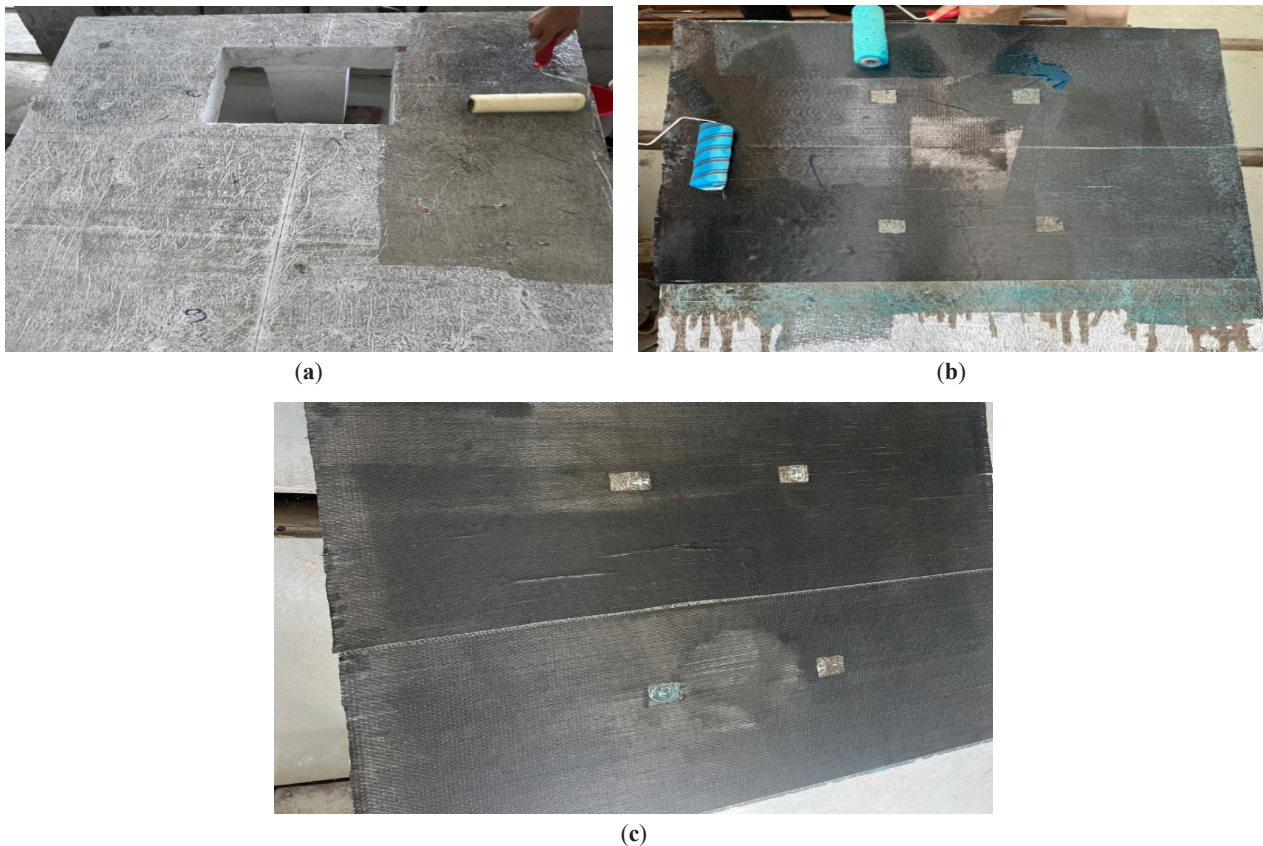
Preparation and externally bonded FRP strengthening procedure: (a) Surface cleaning, crack preparation, and epoxy treatment of visible cracks; (b) Installation of one FRP layer on the slab bottom surface; (c) Final epoxy coating and completed strengthened specimen.
